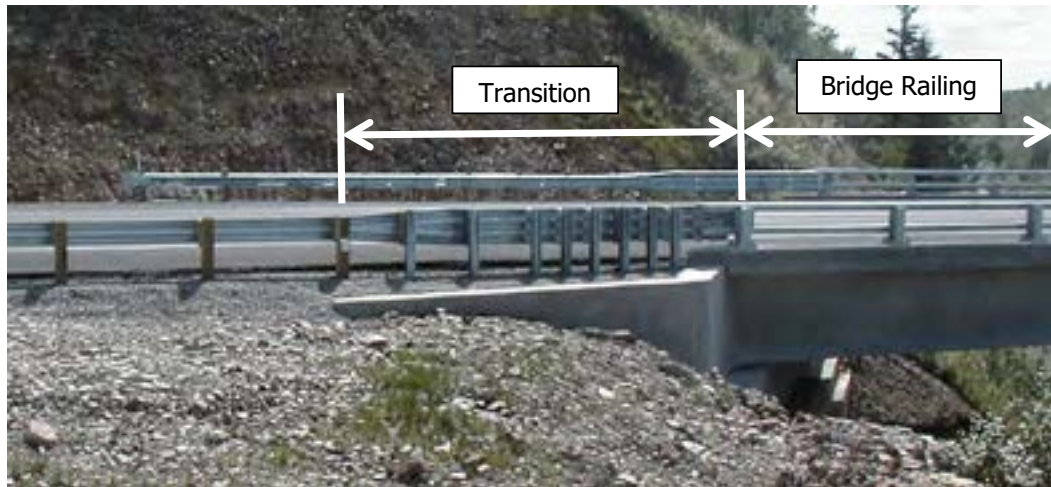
Metal bridge railing and transition. (Source: Alaska DOT)
